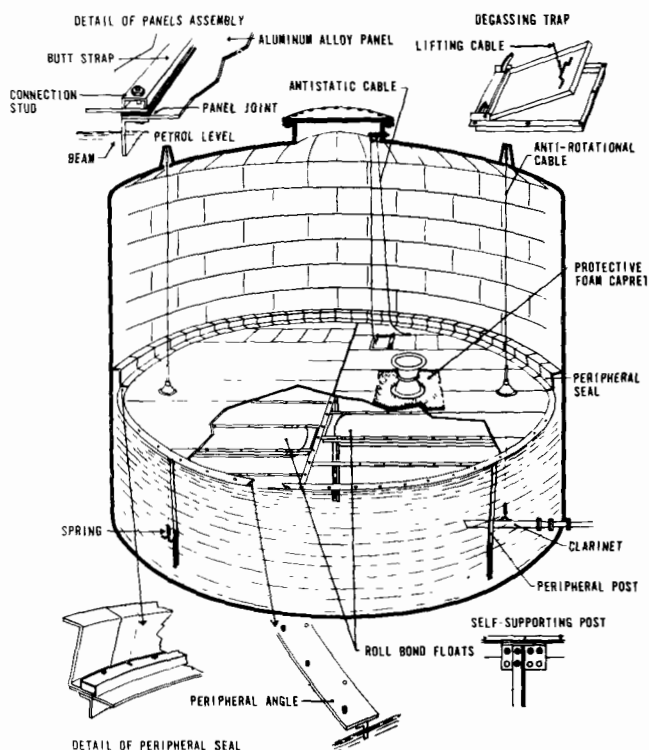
Fixed-roof tank with internal plastic floating blanket (Laroche Bouvier and Company, 5, Boulevard Edgar-Quinet, Colombes (Seine), France).
